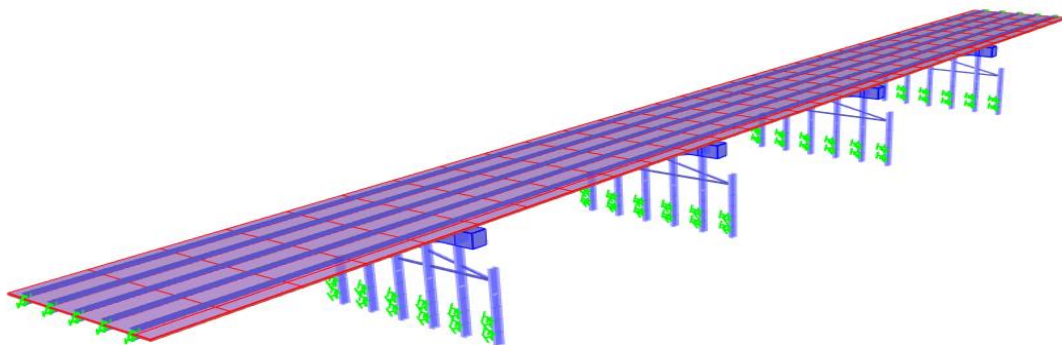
3D finite element view of MSC steel roadway bridge.
